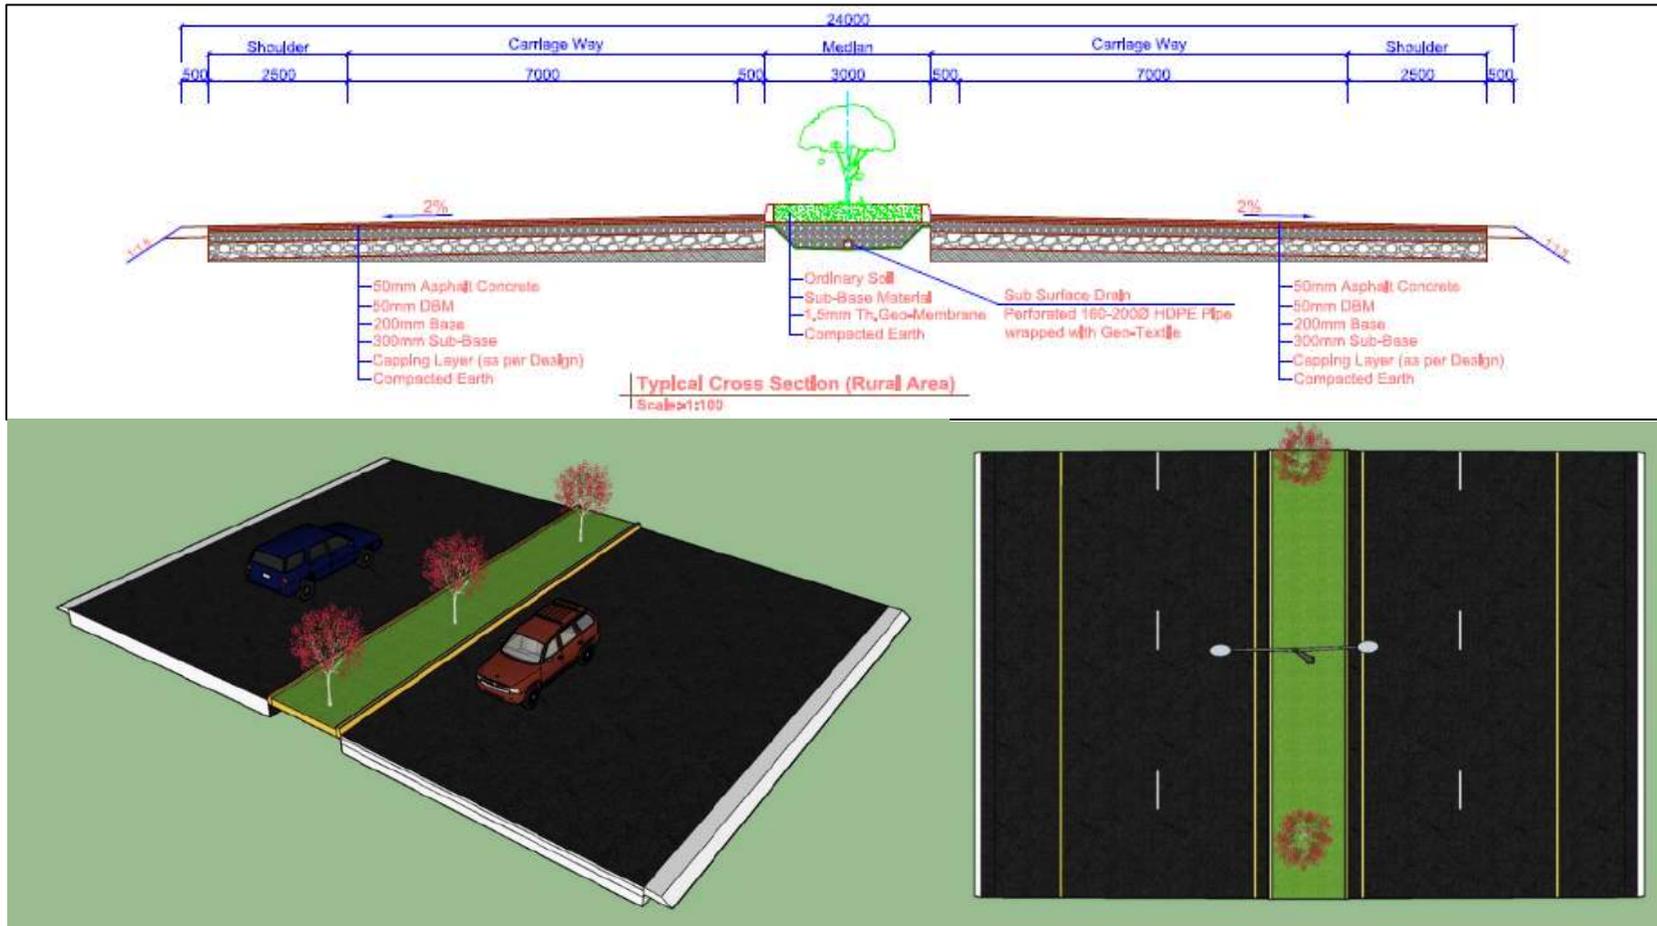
Typical design of road alignment section in rural area (4 lane road)
